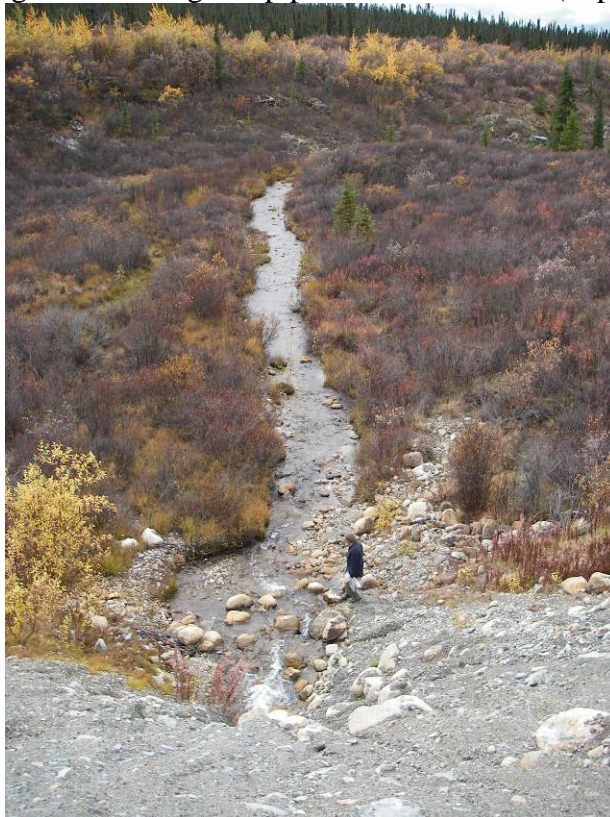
View away from Haul Road on downstream side of HR-7 (Sept. 16, 2007).
